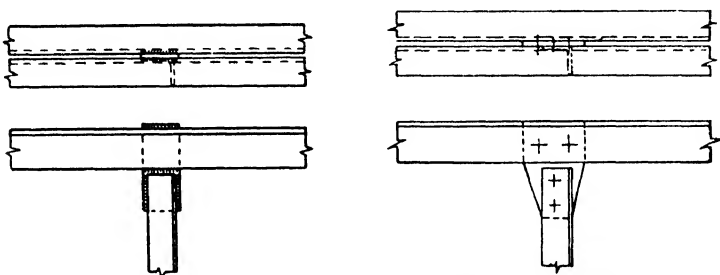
WELDED AND RIVETED ATTACHMENT OF GUSSET PLATE
